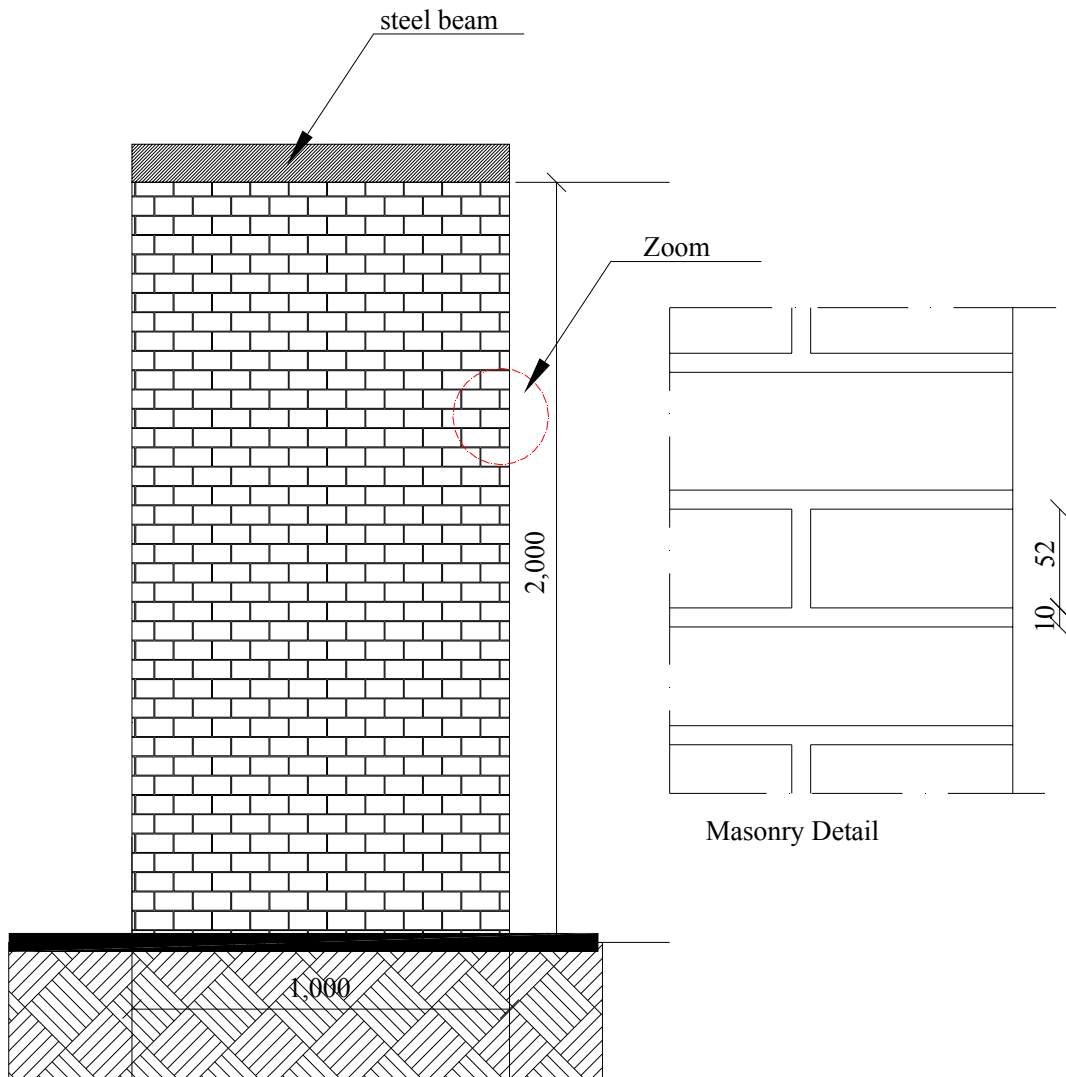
Unreinforced masonry shear walls: high wall (HW)
